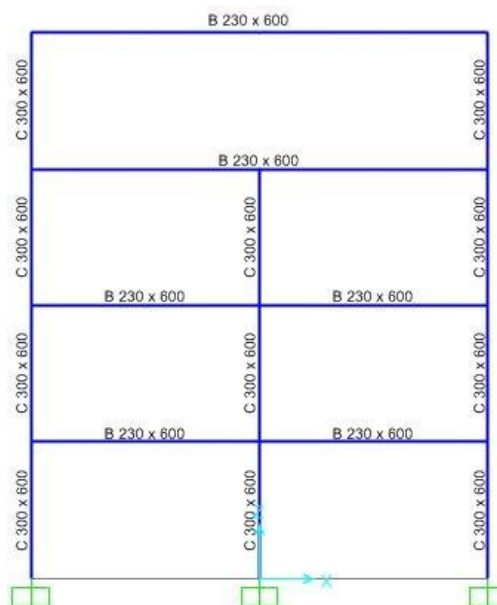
Sectional view (P-P) Irregular Frame having discontinuity at top floor
